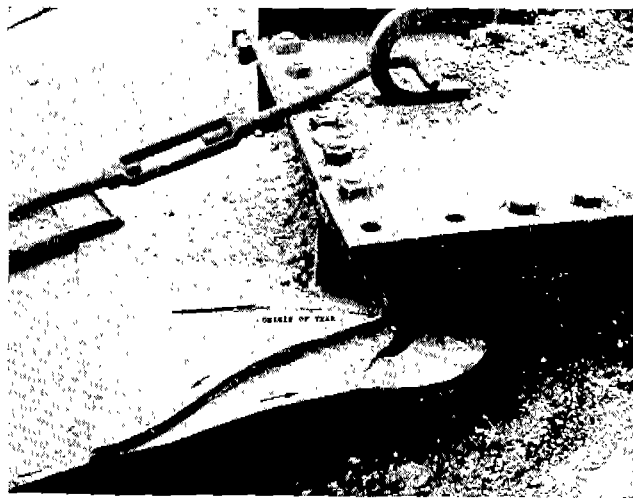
Failed crude oil storage tank, showing brittle tear, with origin of fracture at corner of cleanout door reinforcing plate
